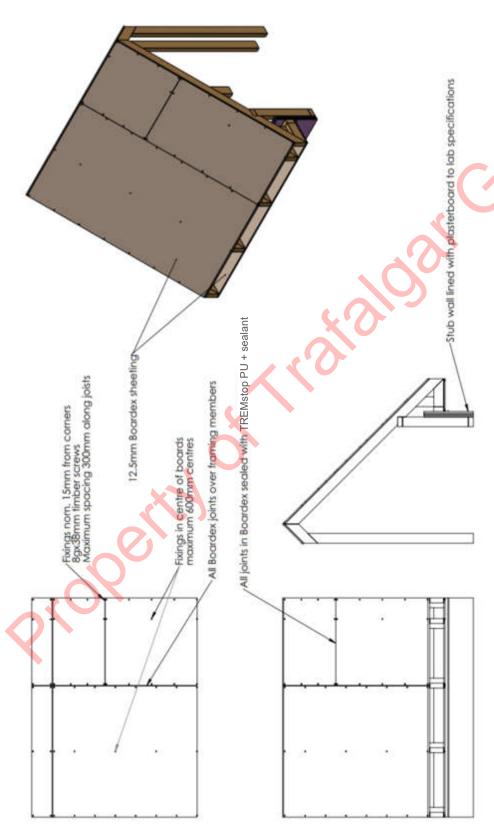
Plan view showing fixing centres for Trafalgar Fire BoardeX linings
